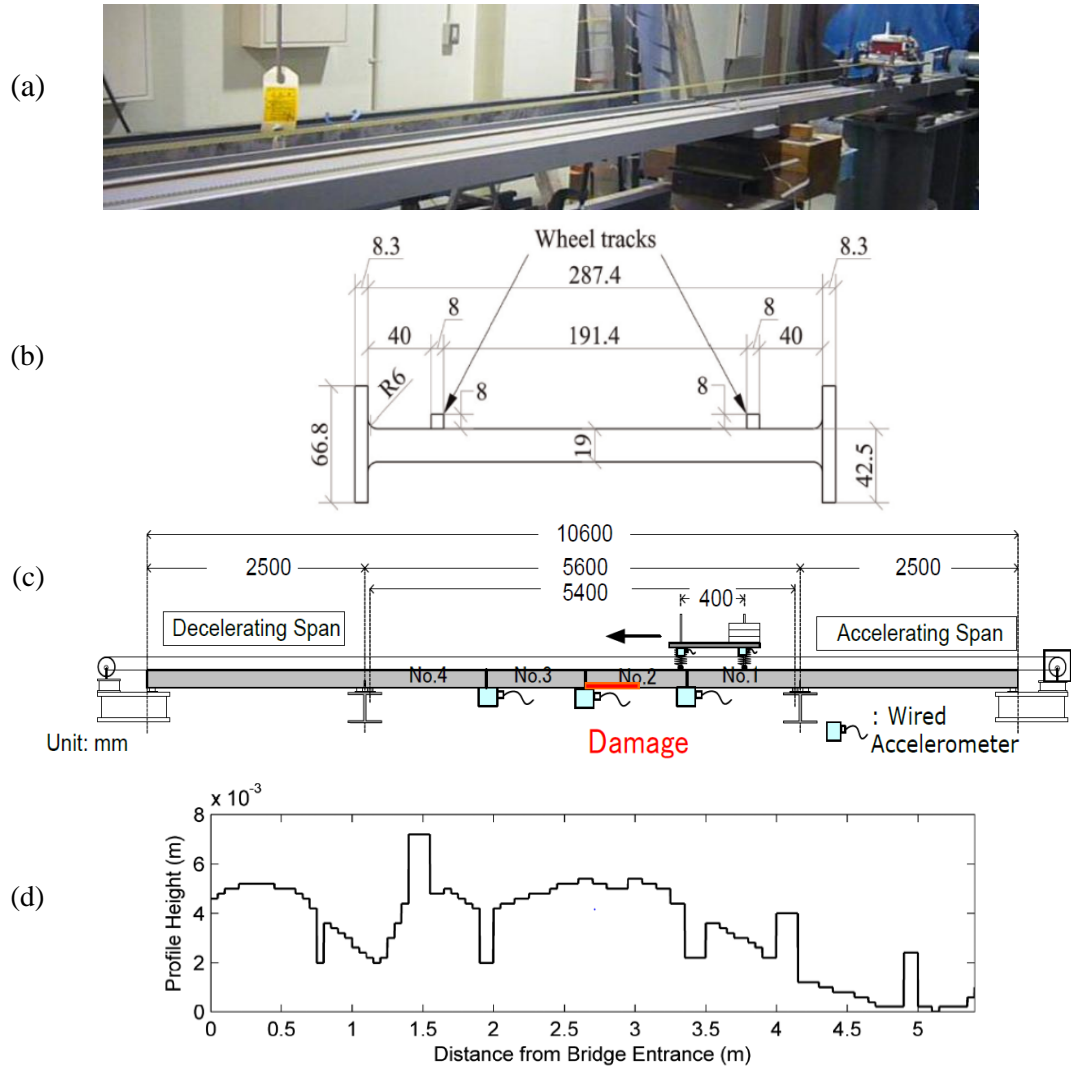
Scale model bridge: (a) Photograph of set-up, (b) Beam cross section (unit: mm), (c) Elevation, (d) Track profile.
